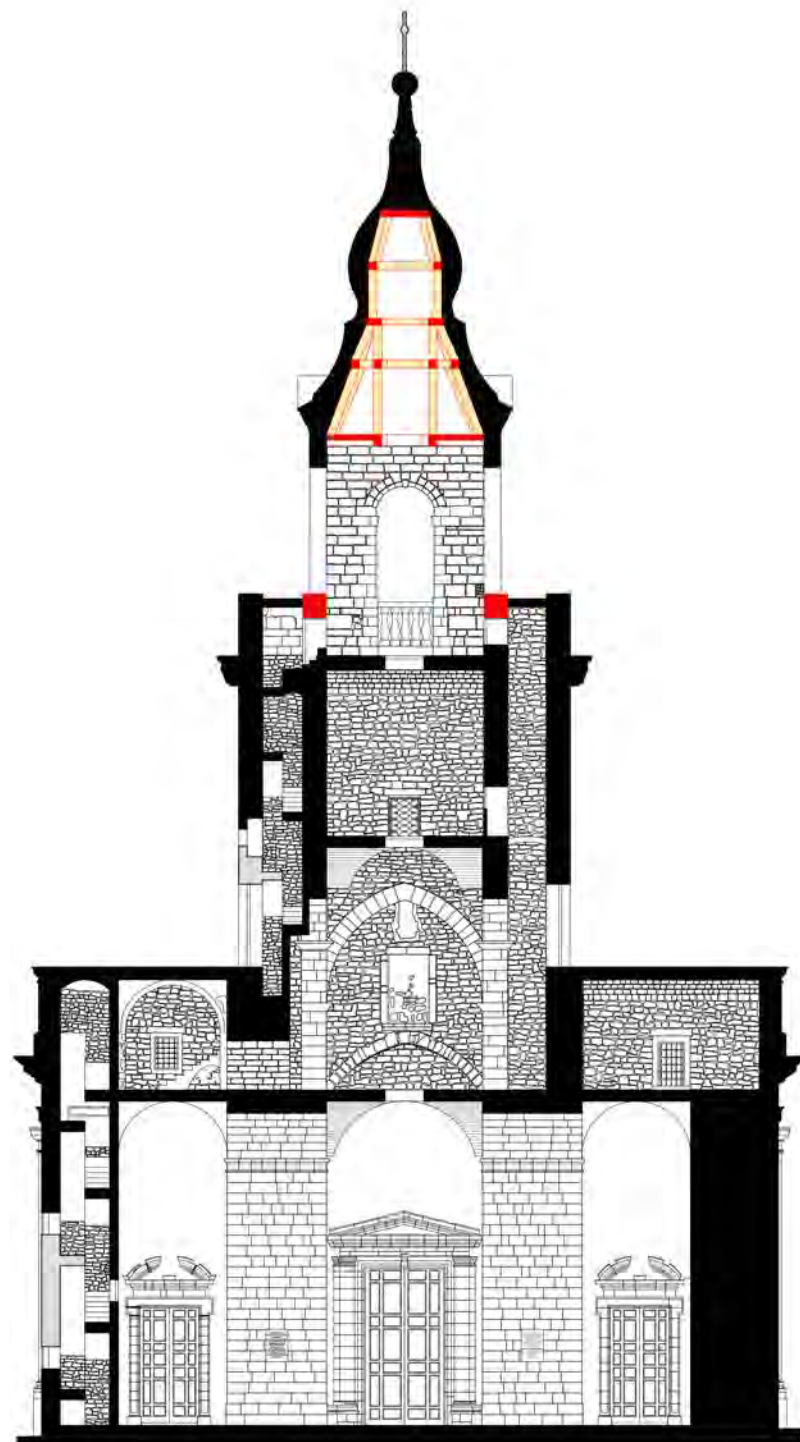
Comiso, Santa Maria delle Stelle church, architectural survey of the façade-tower, section of its structure. The reinforced concrete elements are highlighted in red [Gatto 2018].
